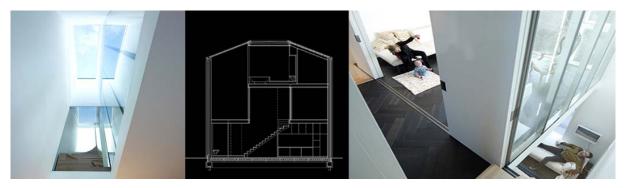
Light House, Amsterdam (Arch. Borduin, NL), Indoor depictions and building section
